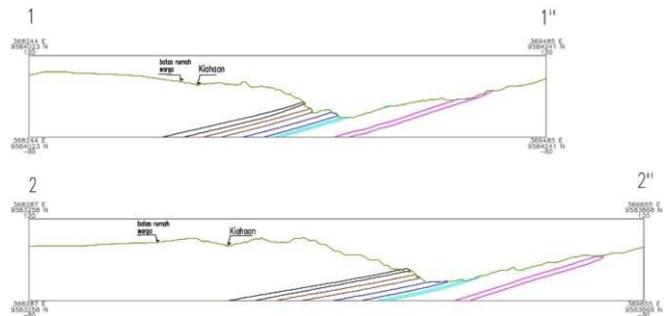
Section of Geometry Bench Pit 1 West Banko
